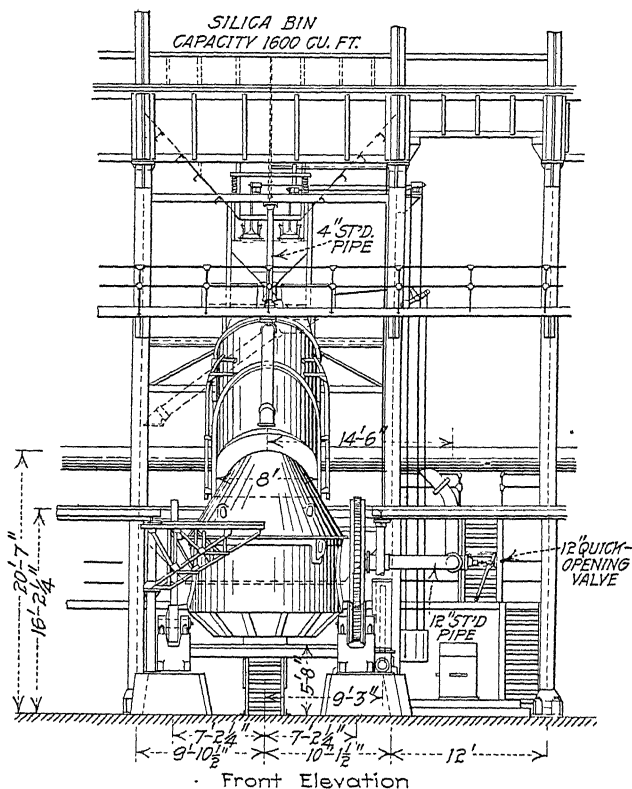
CONVERTER PLANT, INTERNATIONAL SMELTING CO.
